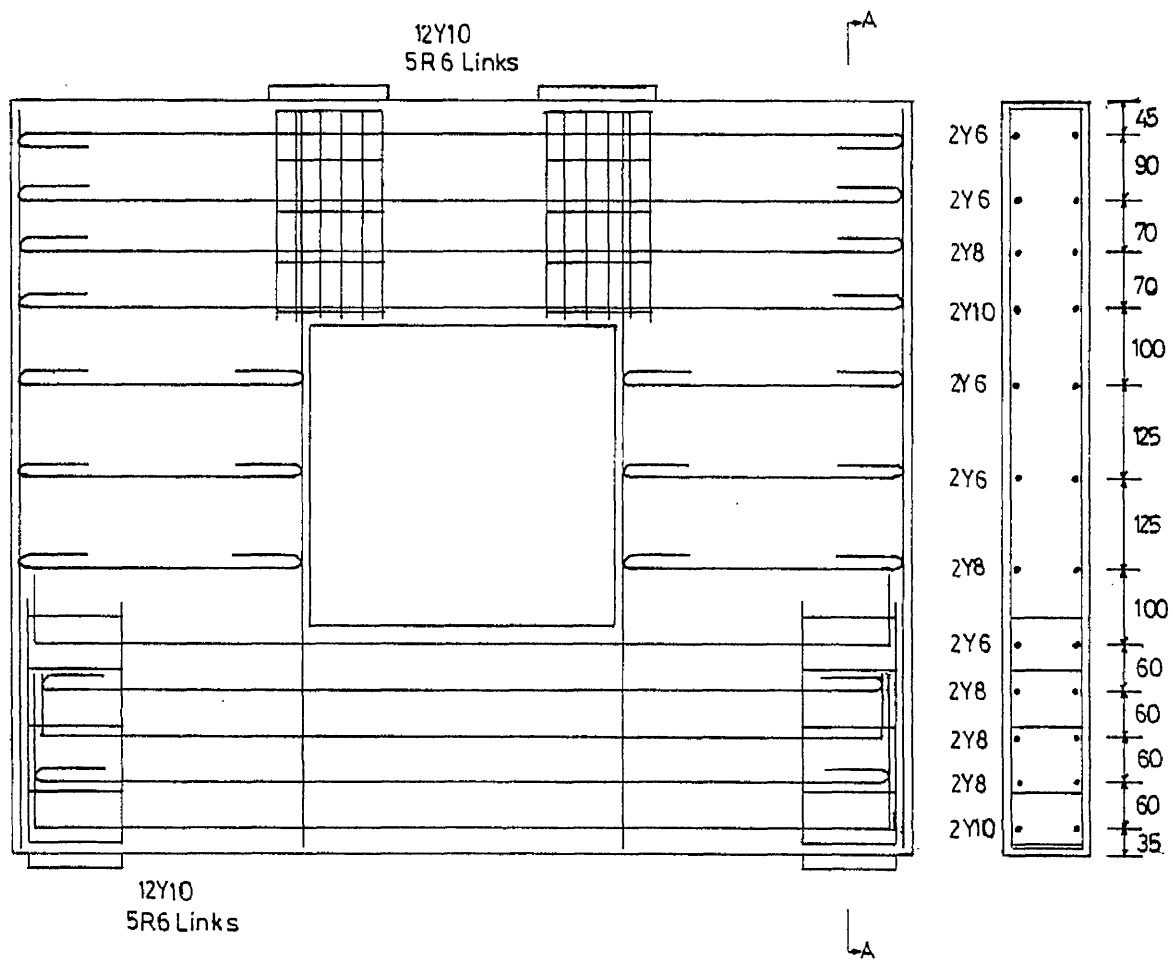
ARRANGEMENT OF REINFORCEMENT FOR BEAM B6. SECTION A-A.
